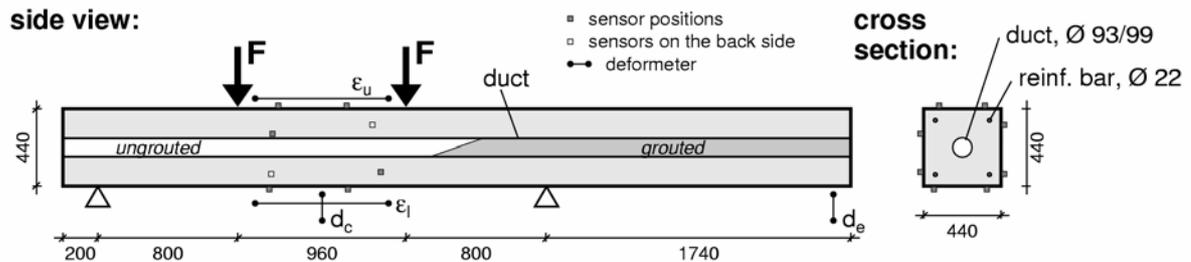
Side view and cross section of the concrete beam showing the loading configuration and the positions of AE sensors and deformeters.
